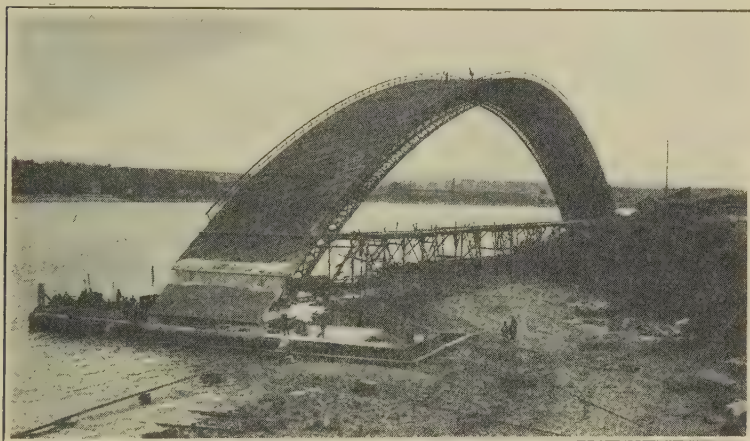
COMPLETED CENTERING ON CONCRETE BARGES READY TO LAUNCH.
